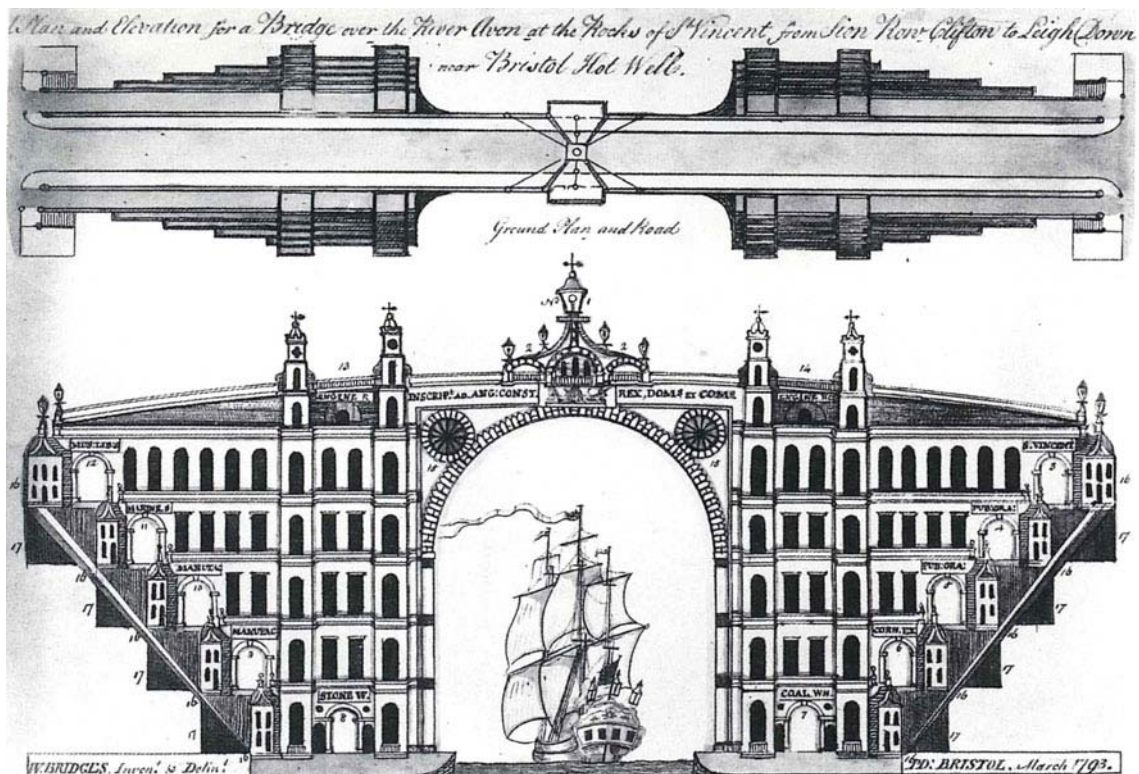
William Bridge, Plan & elevation, for River Avon, Rocks of St. Vincent's, Bristol, England, 1793 (from the book "Living Bridges")
